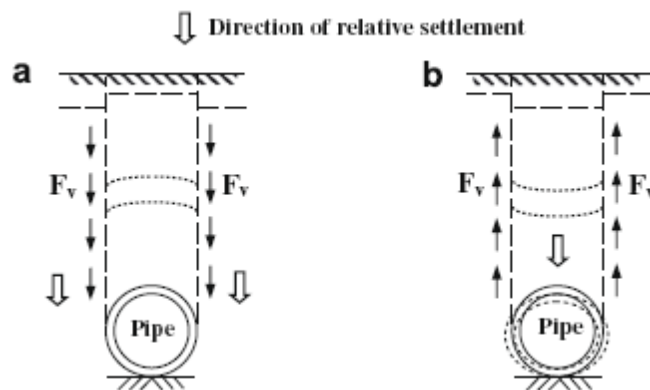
Mechanism of Soil Arching within Soil-pipe System (Kang et al. 2009)
